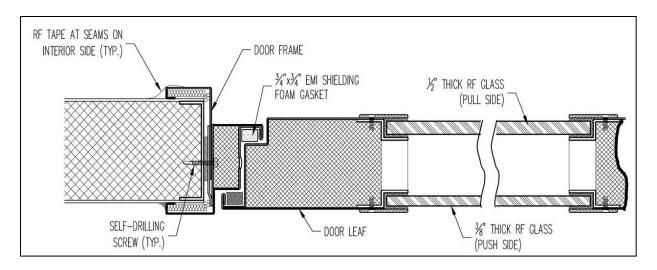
Fabrication details: typical door seals (plan view). (Adapted from Noise Barriers, LLC, 2011.)
